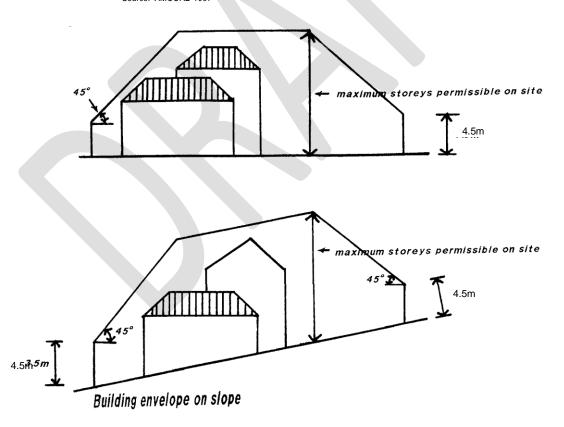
SIDE ELEVATION OF BUILDING ENVELOPE
